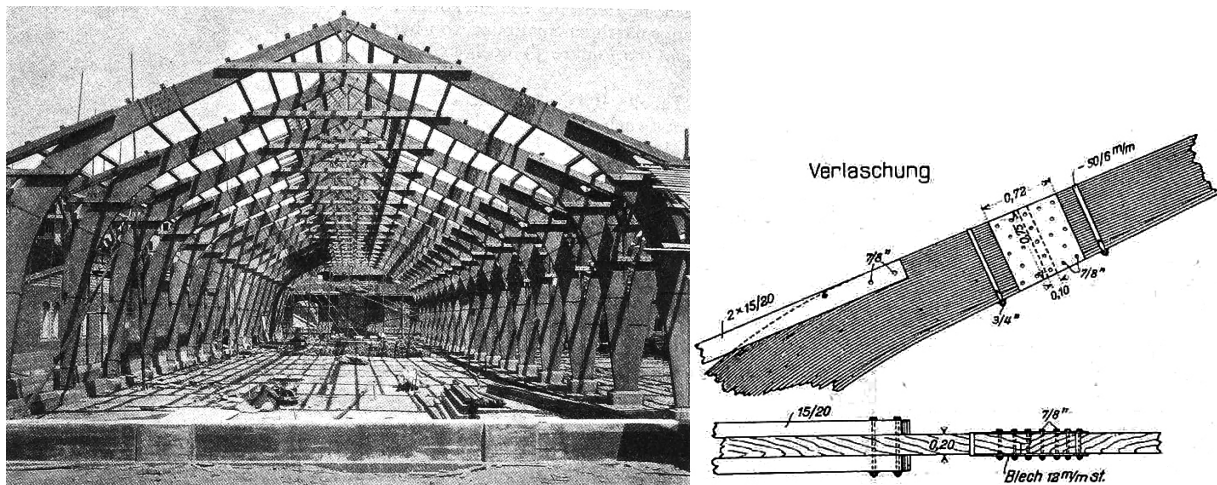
(a) Swiss Railway depot in Bern (1913) during construction and (b) joint detail (SBZ 1913)
